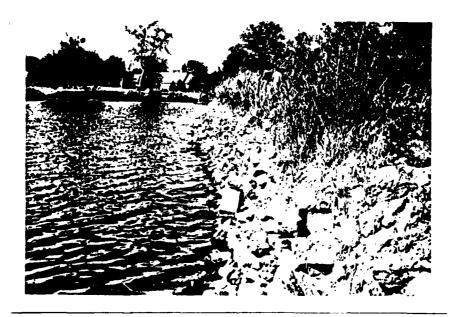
Picture of upstream embankment slope taken on upstream slope near center of dam.
